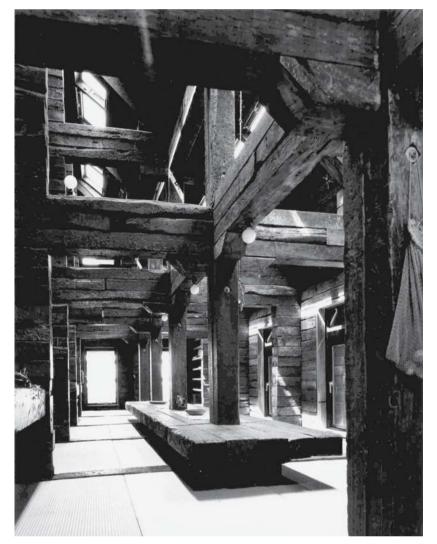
The dining hall extends the full internal height of the building Shin Takasuga: "Railway Sleeper House", Miyakejima (J), 1980
